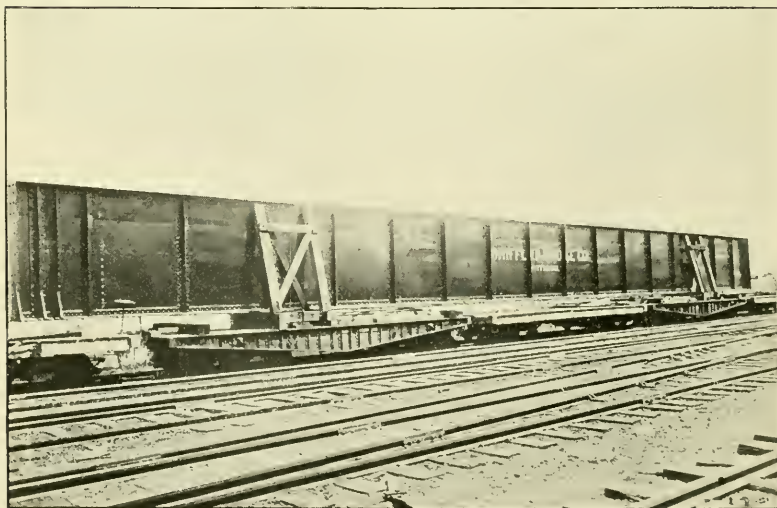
123-FOOT GIRDER, PHILADELPHIA.
